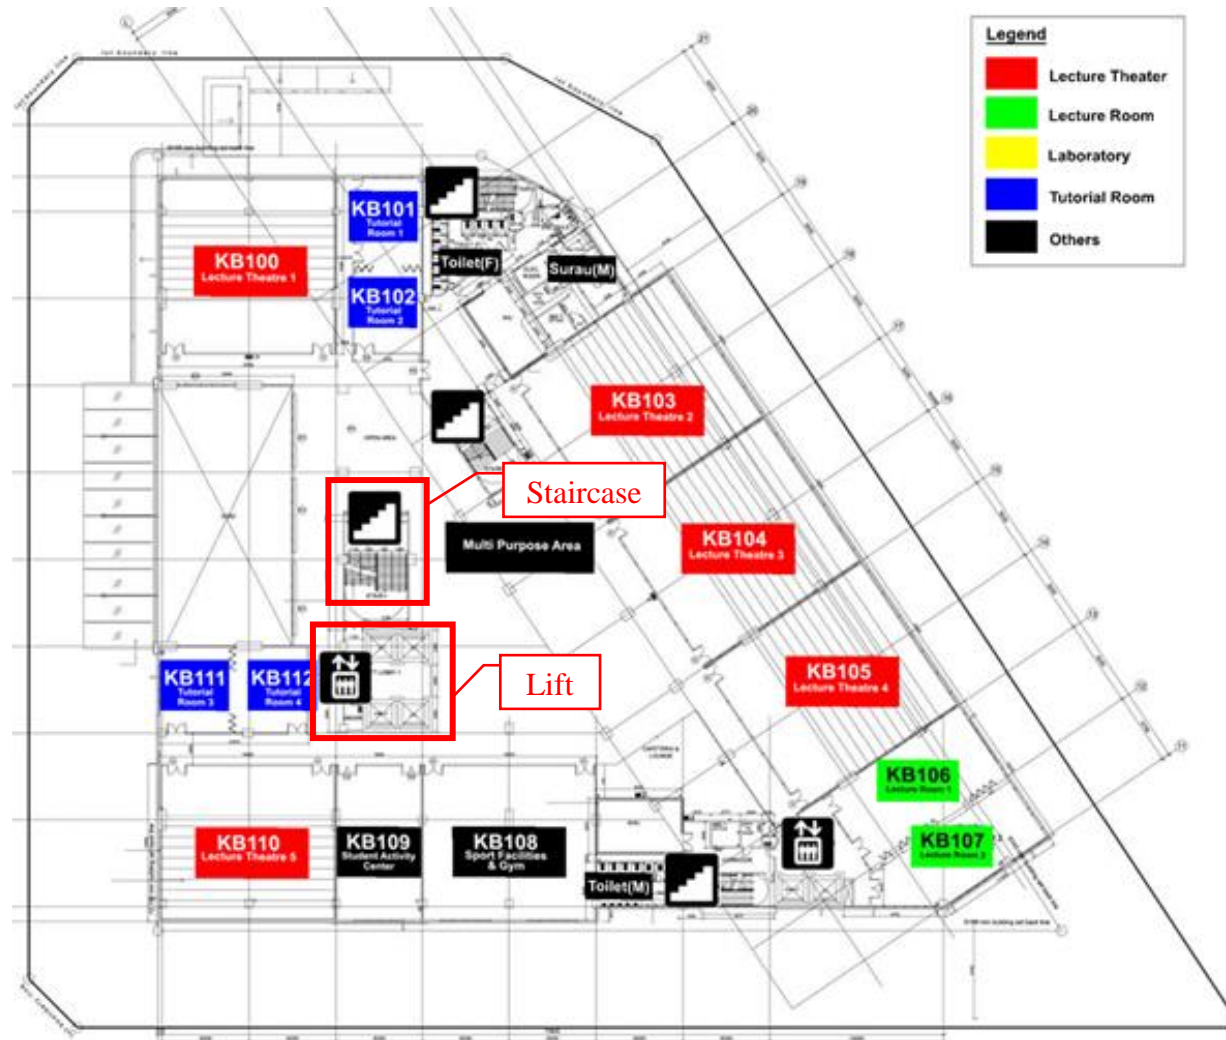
Sungai Long KB building floor plan – 1st floor.
